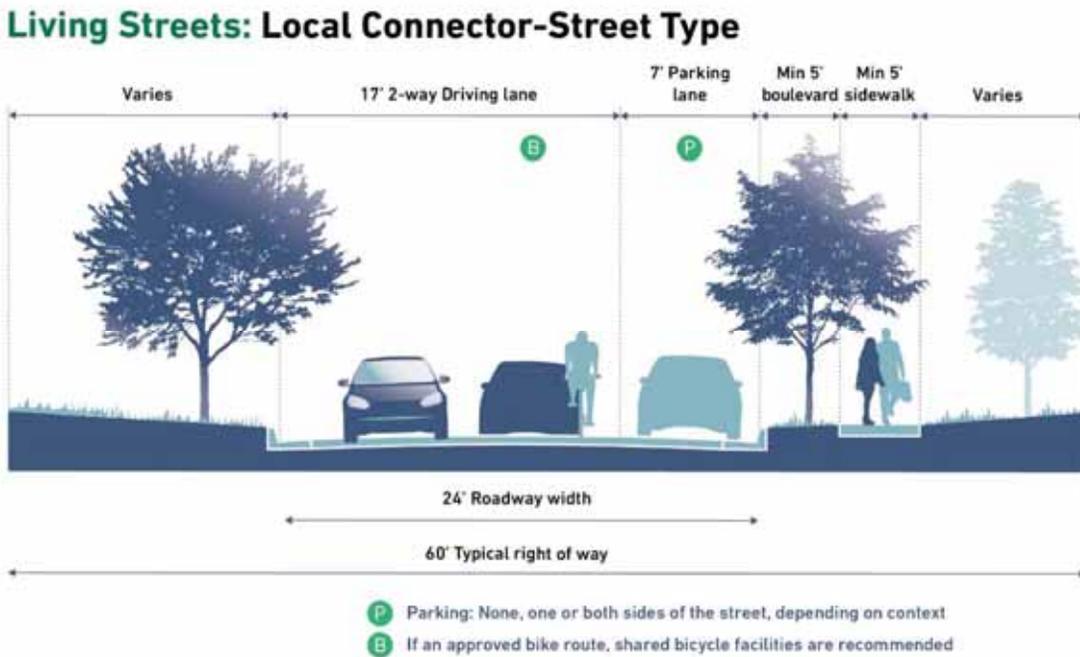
PROPOSED CONNECTOR STREET TYPICAL SECTION
